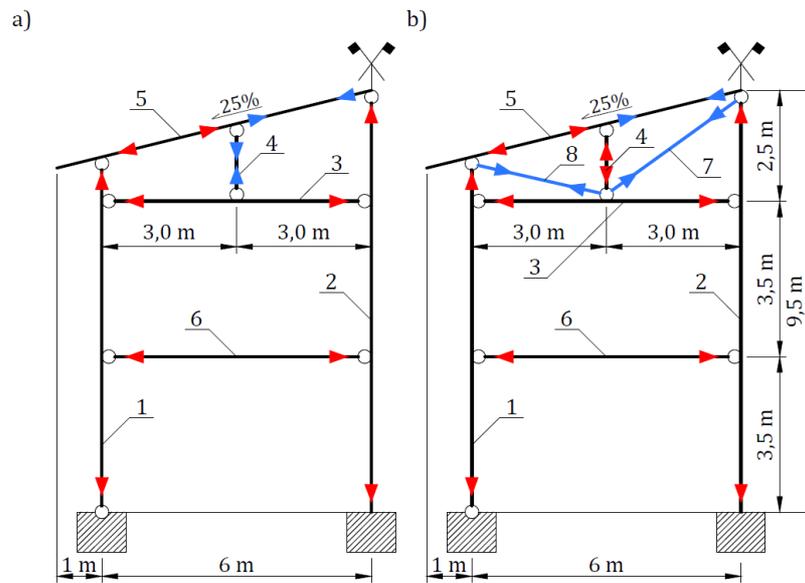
Static diagrams of the analyzed load-bearing structure of the house design: a) scheme A: without additional tendons; b) scheme B: with additional tension tendons; 1 – external column; 2 – central column (building core); 3 – support beam; 4 – the column supporting the roof truss; 5 – roof rafter; 6 – ceiling beam; 7, 8 – tension tendons
